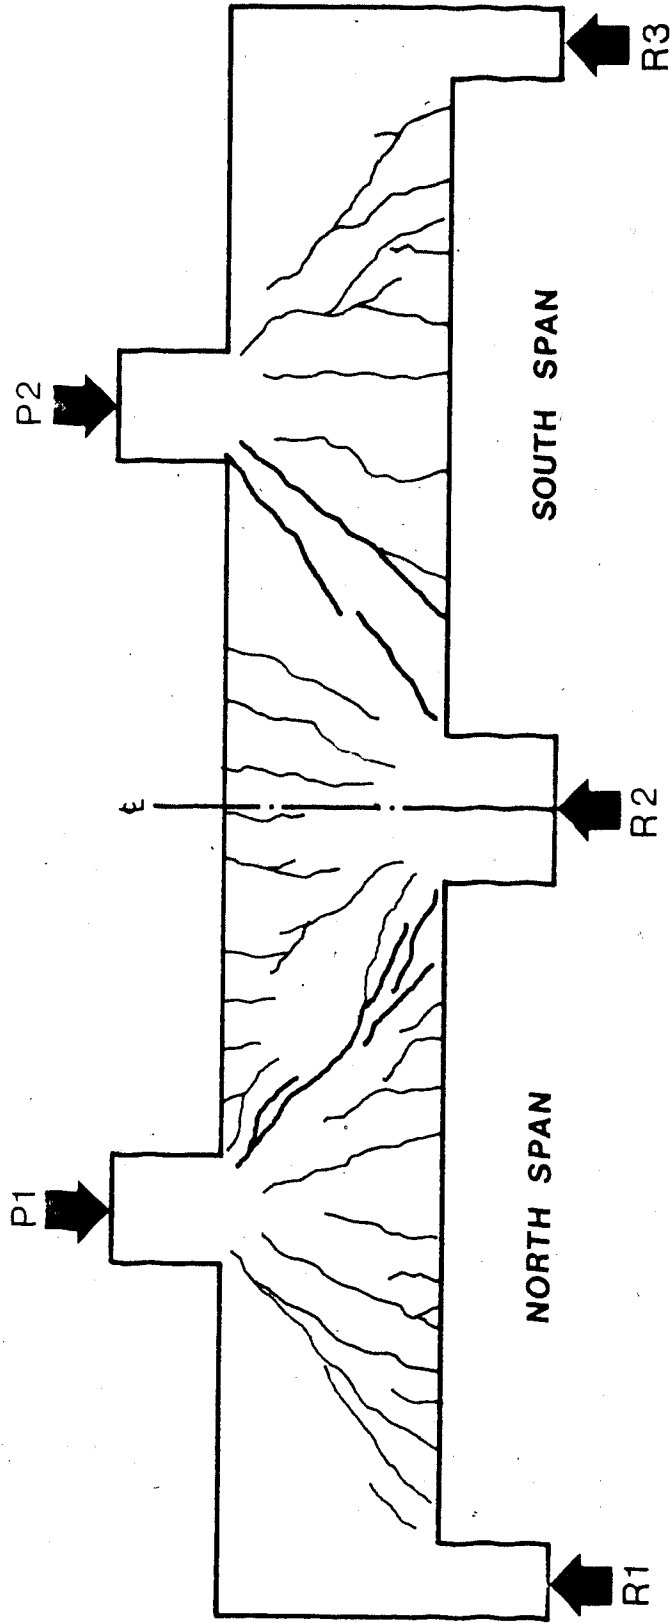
Failure Cracking Pattern of Beam No. 3
